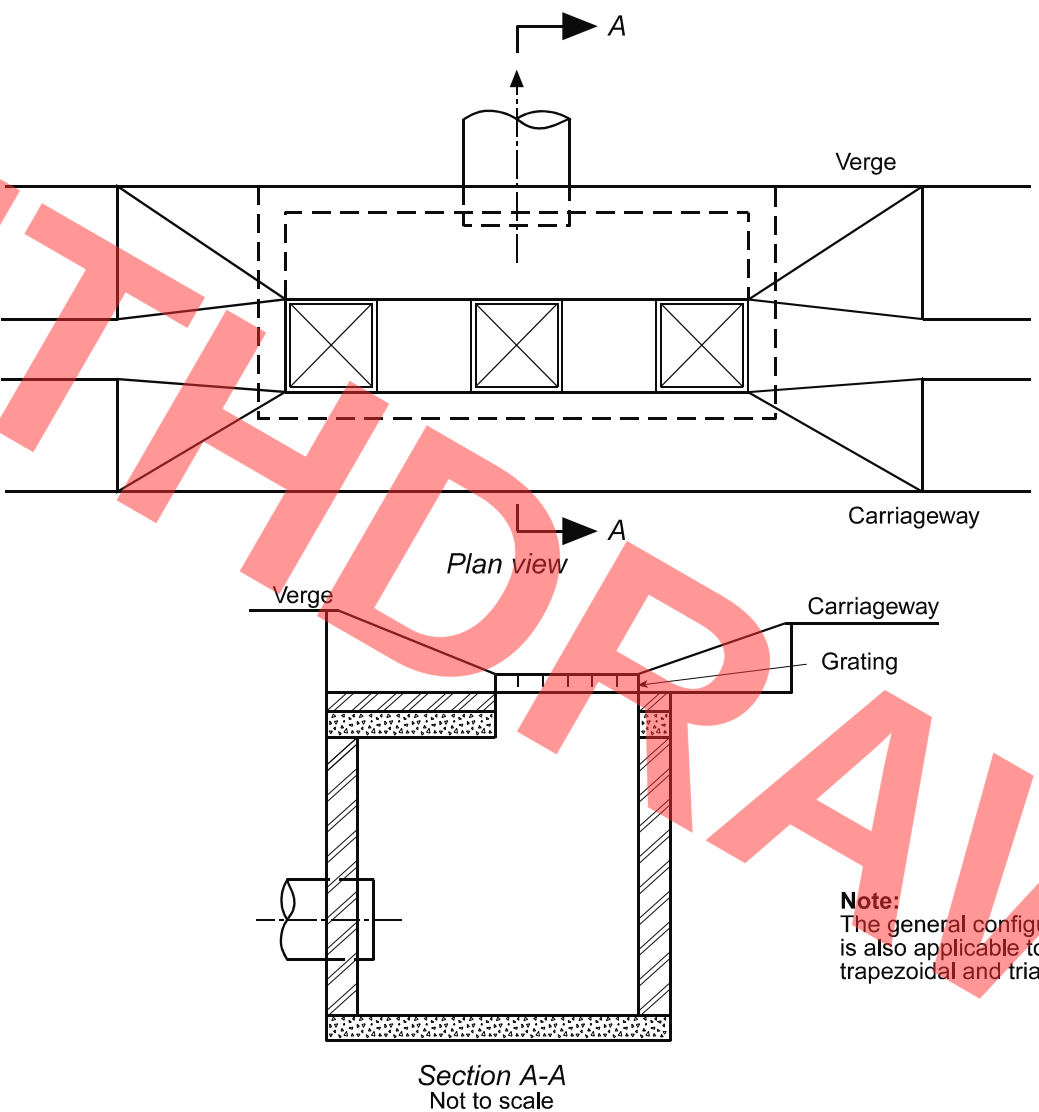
Example of collecting chamber for in-line outlet in trapezoidal channel
